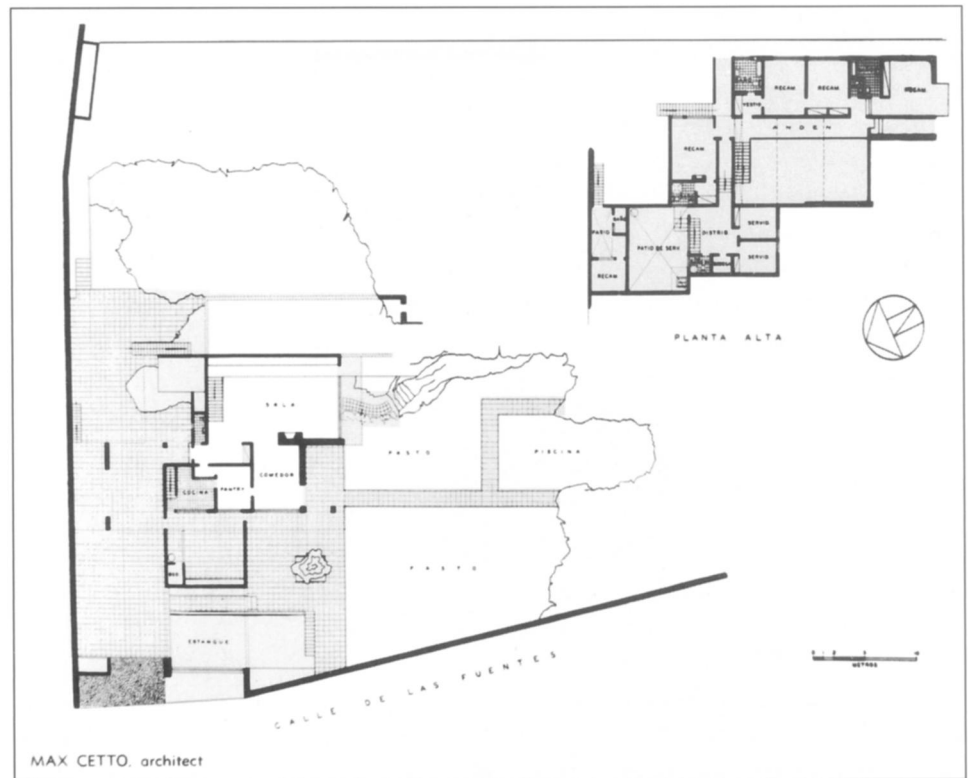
Barragán and Cetto, 140 Fuentes, plan of house and garden, from I. E. Myers, *Mexico's Modern Architecture* (New York, 1951)
